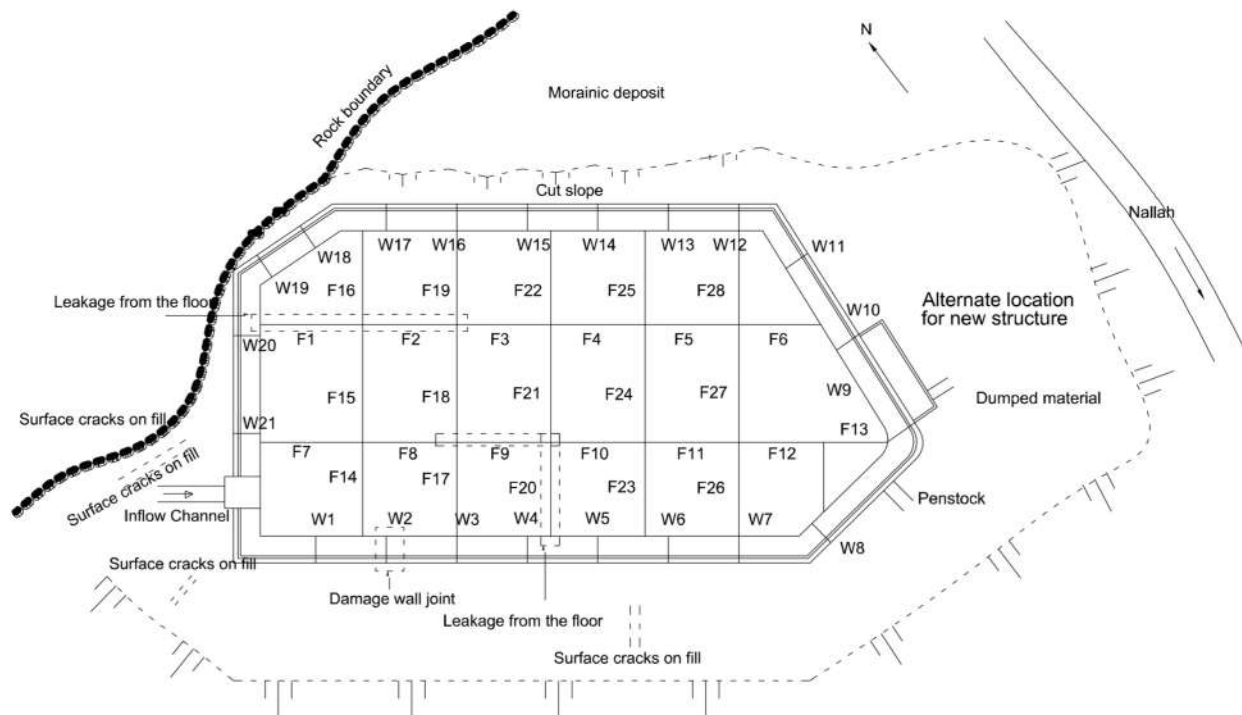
(Approximate) General Layout Plan of the Forebay Structure.
